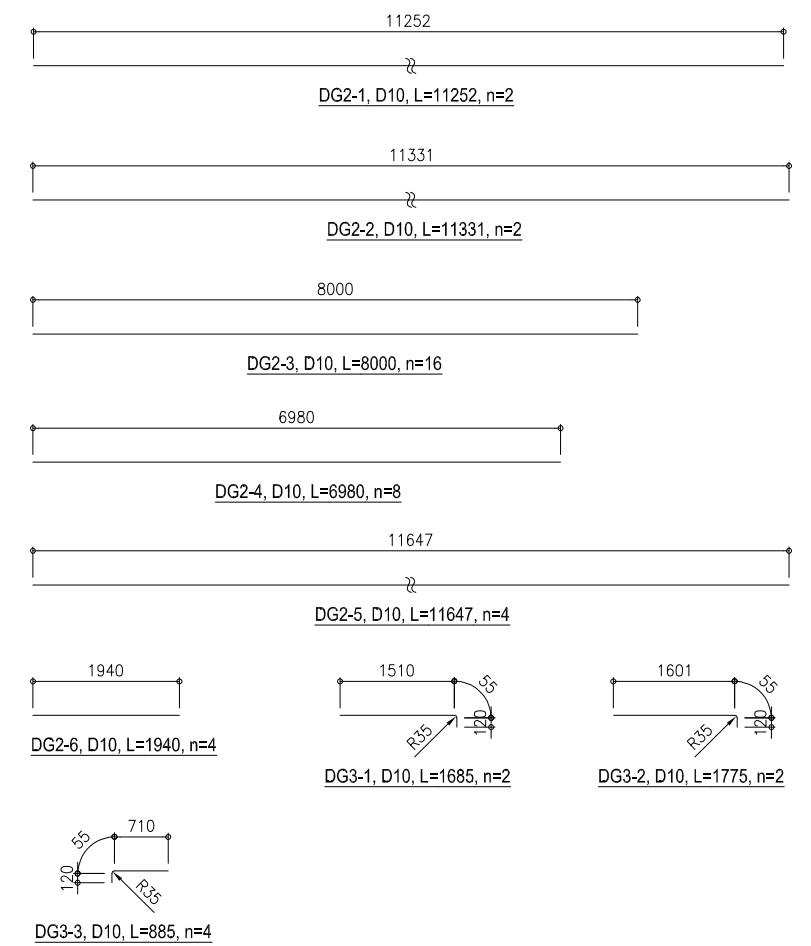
DETAIL OF GUTTER / CHI TIẾT RÃNH
